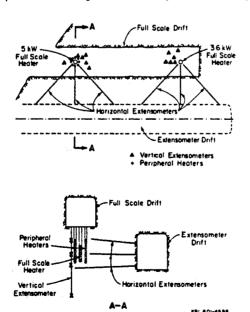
Geometry of the full-scale heater experiments. Top: plan view; bottom: vertical section.
